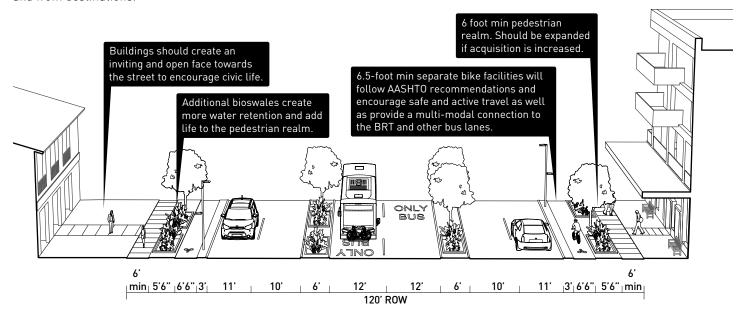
Greens Road Potential 120' ROW Cross Section
